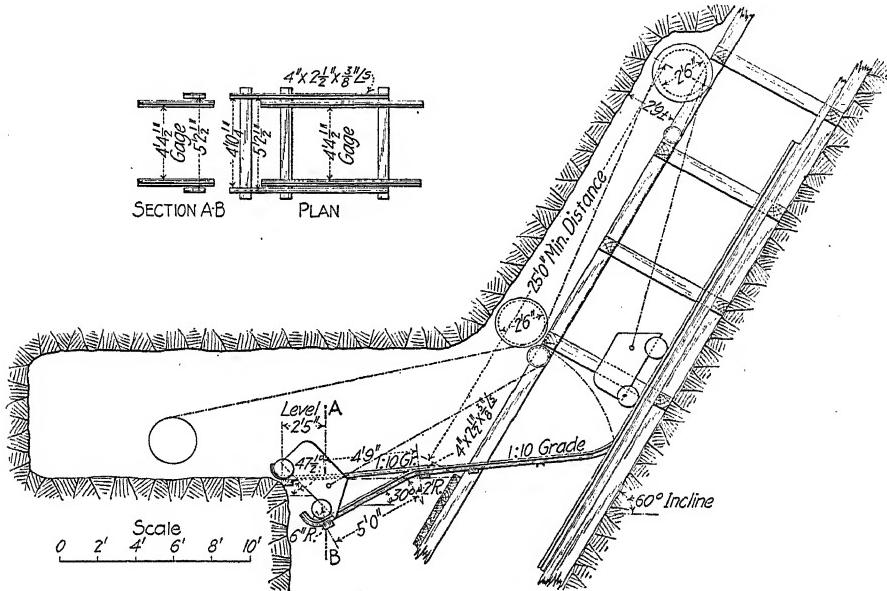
$1\frac{1}{4}$ -TON SINKING SKIP AND OUTLINE ARRANGEMENT OF TIP, KIMBERLEY SHAFT, ROODEPOORT UNITED MAIN REEF GOLD MINING COMPANY, LTD.
